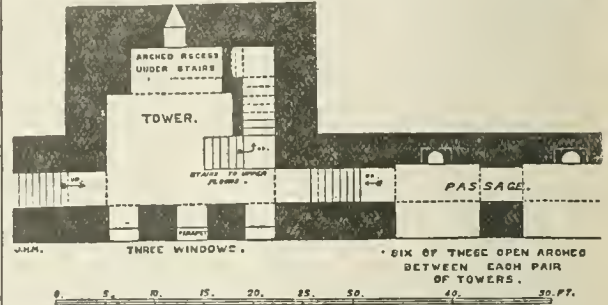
Aurelian's wall; plan showing one of the towers and the passage in thickness of wall.
